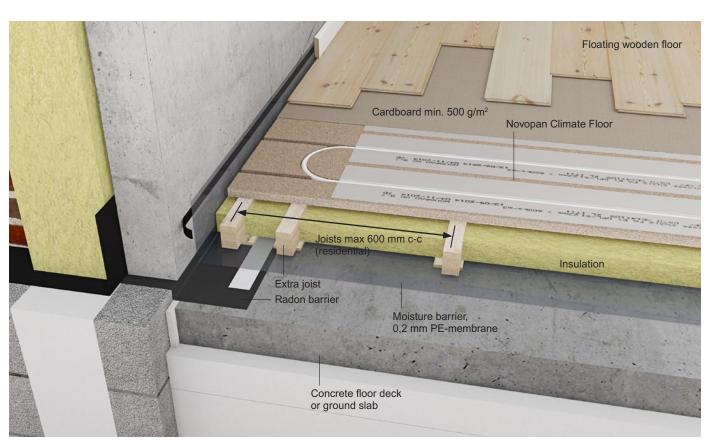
Novopan Climate Floor laid on joists and finished with a floating wooden floor.
